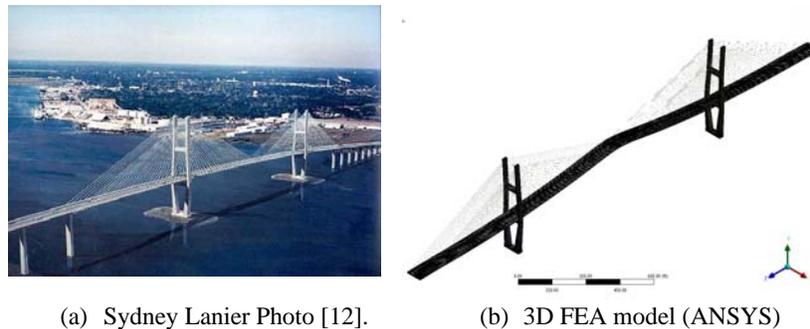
The Sydney Lanier Bridge in Brunswick, GA and its FEA model.
